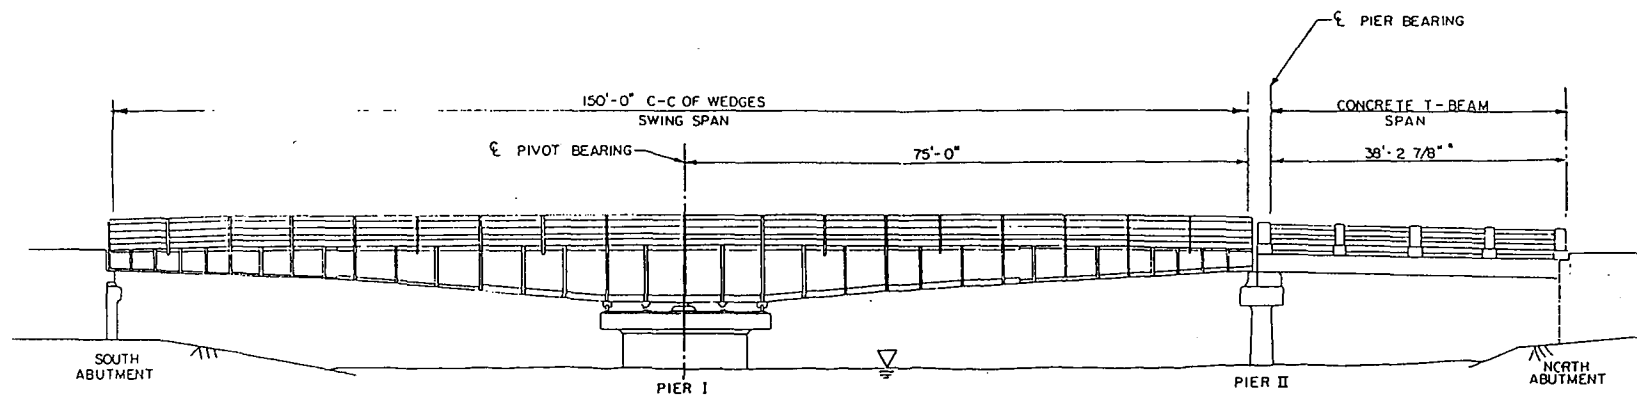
East Elevation of Mobile Bridge (013-49-003.2)
